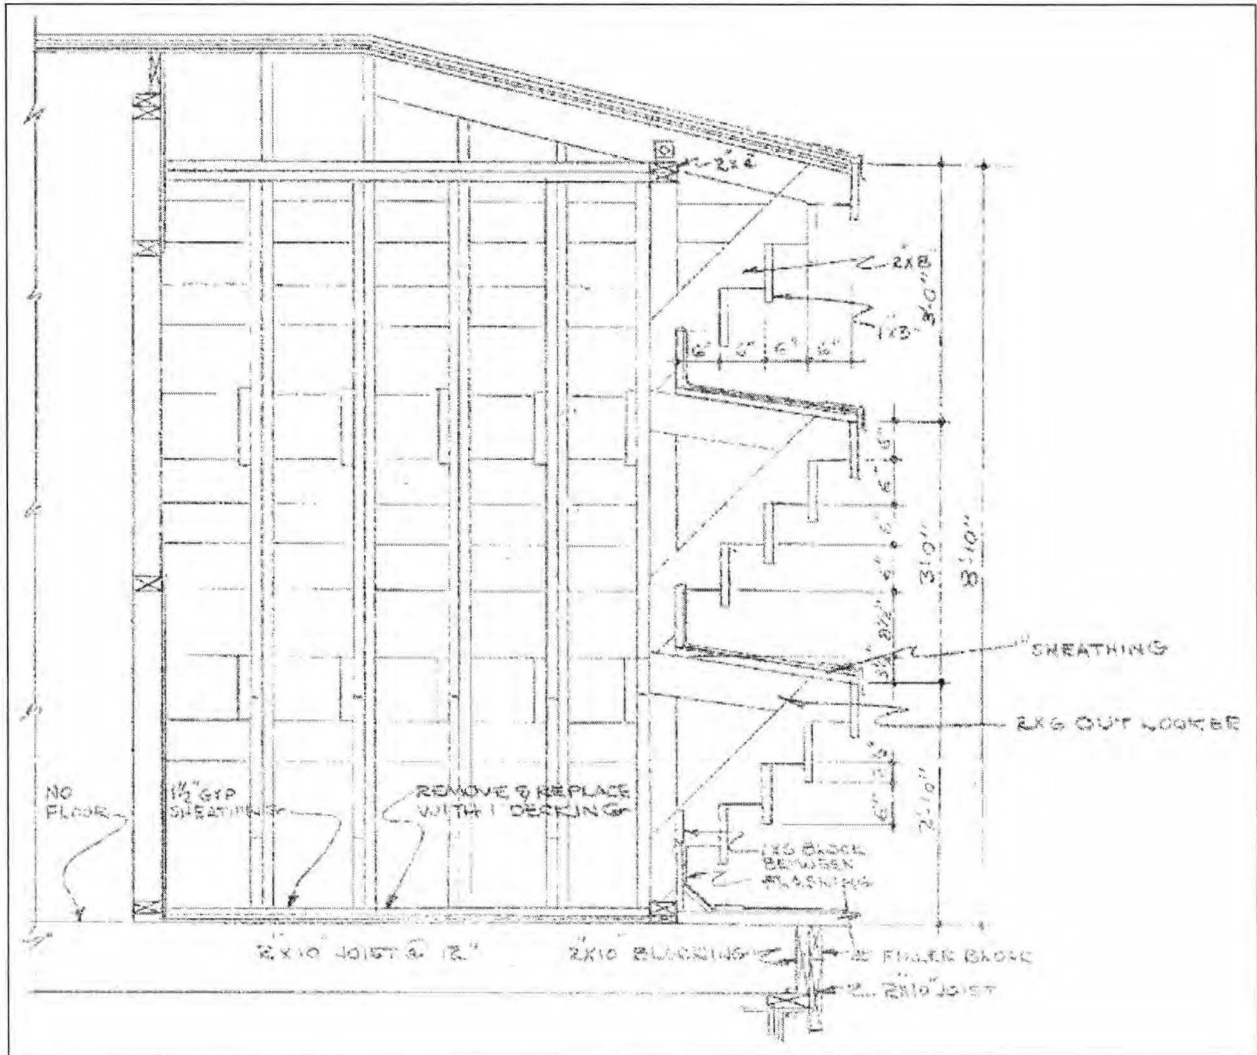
Cross-section of Original Fan House. (Y&D Drawing No. 325-720)
